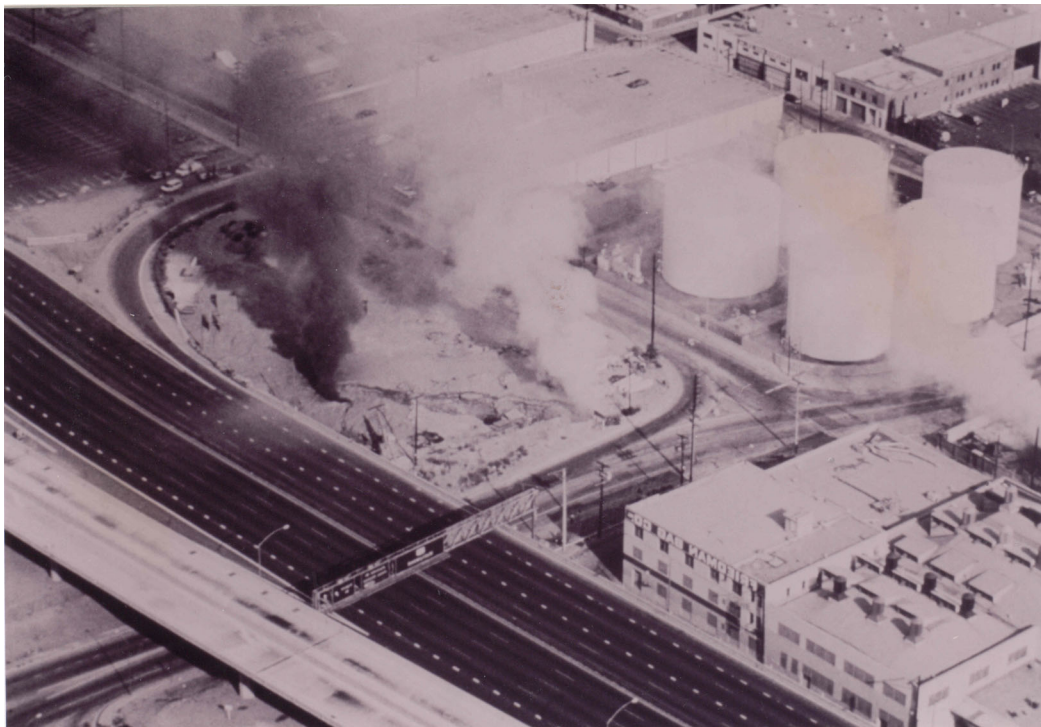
Collapsed Tunnel due to Los Angeles Subway Fire.
